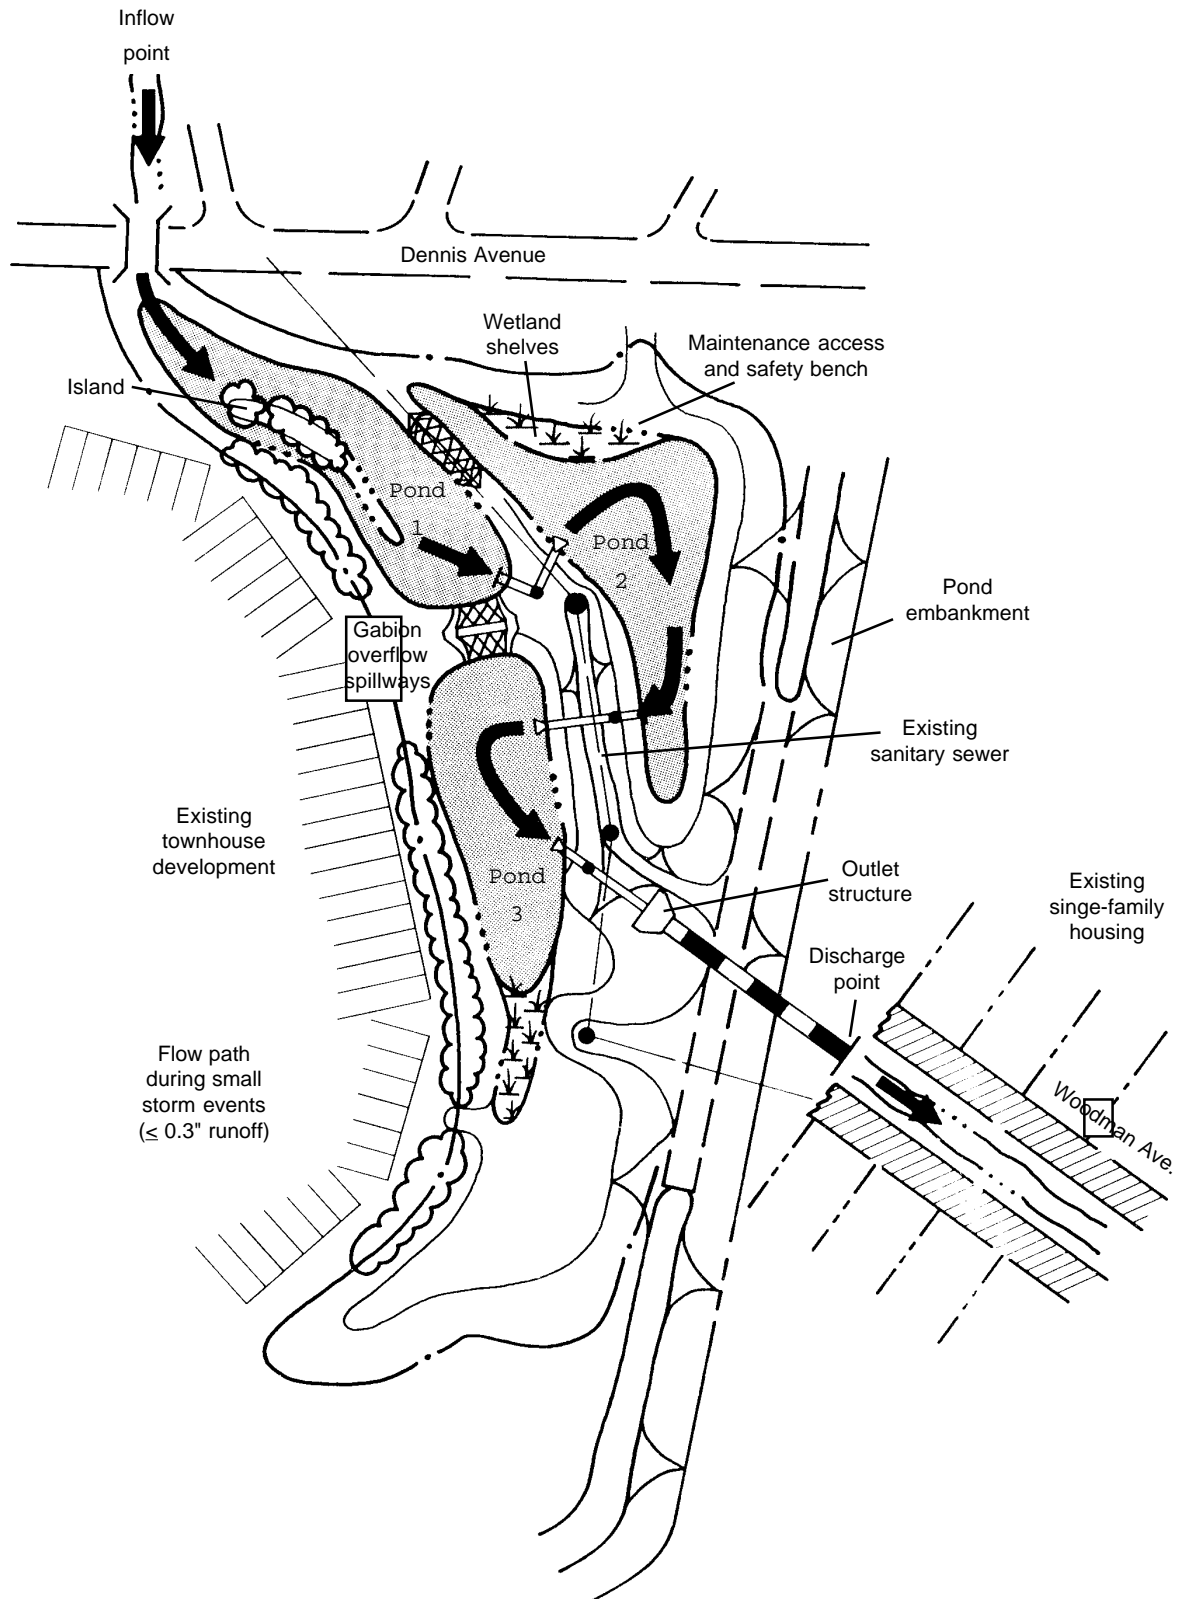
(A): Wheaton Branch retrofit (Adapted from Loiederman Assoc. Inc.)
